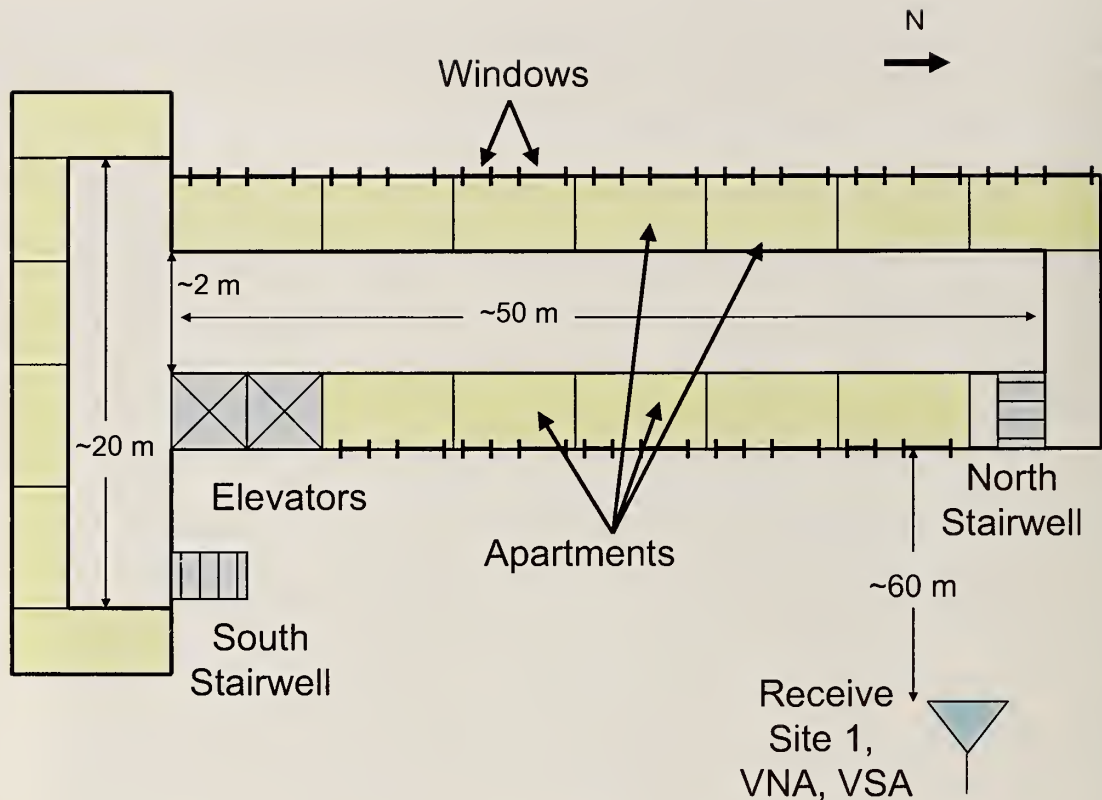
Layout of a single floor of the 11-story apartment building studied by NIST. A T-shaped corridor is lined with apartments that face the outside of the building. Each apartment has at least two large windows to the exterior. NIST equipment was positioned on the ground floor approximately 60 m from the building. An additional receiver site was located approximately 80 m north of the building. The drawing is not to scale, but critical dimensions are noted. Even though marked “receive site,” for the VNA measurements, the transmitting antenna was placed there.
